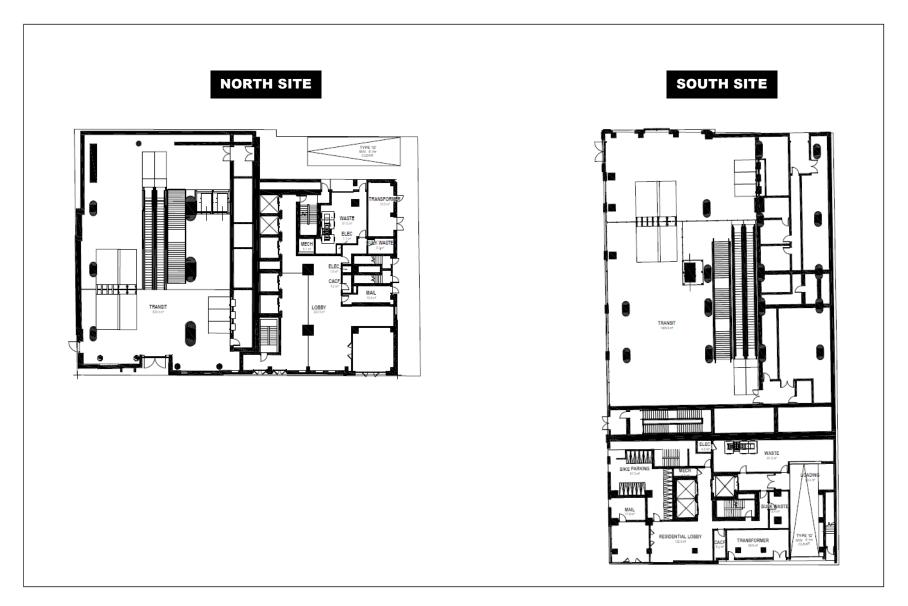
Conceptual Site Plan – Level 01 of North and South Sites (May 21, 2021)
